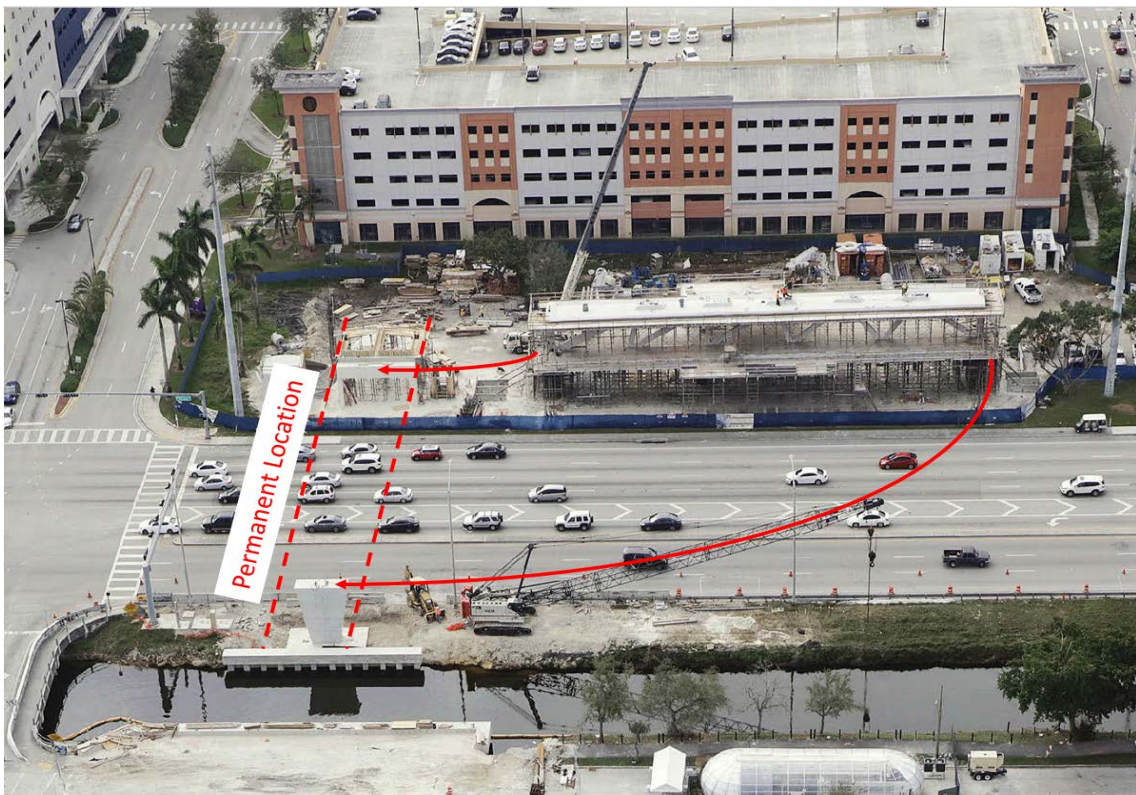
Illustration of Accelerated Bridge Construction (ABC) method (looking south).⁶
